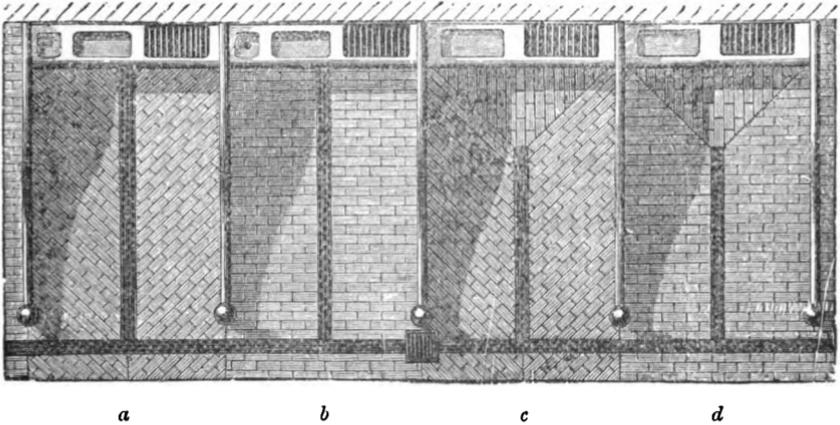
Methods of laying Paving Bricks in Stalls ; *b* and *d* are good arrangements.
